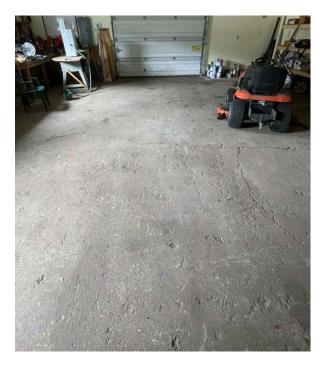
Extensively Cracked and Spalled Concrete Floor Slab
